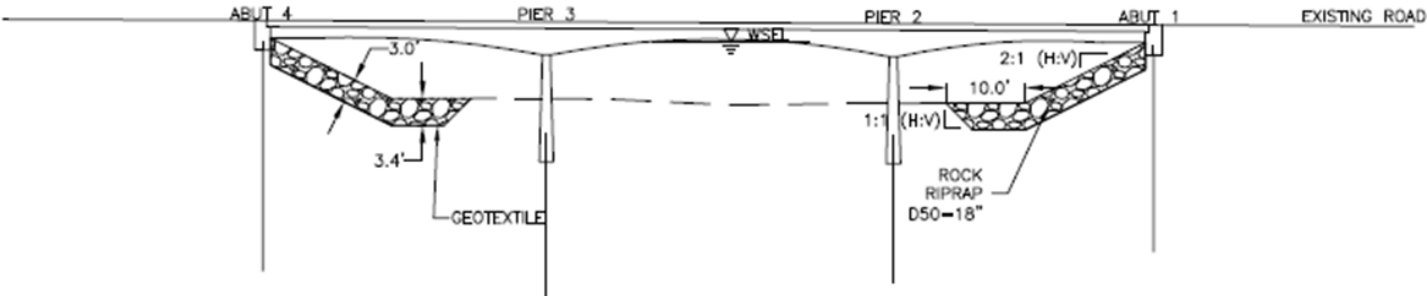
Cross-sectional view of Bridge G-18-BC with recommended hydraulic scour countermeasures
